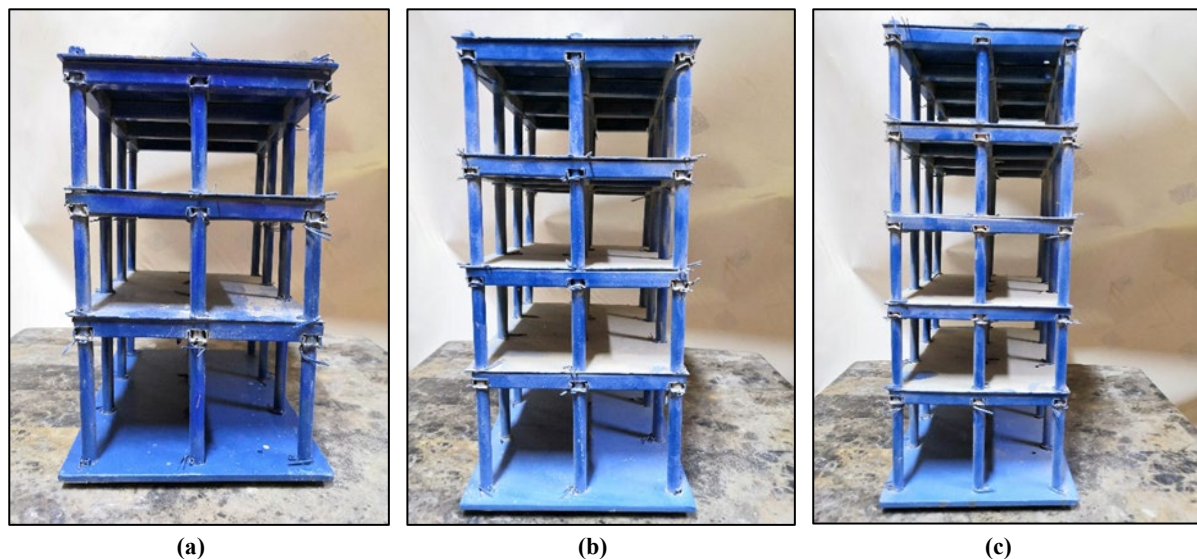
Manufactured steel building frames used in the study: (a) Three-story building (b) Four-story building (c) Five-story building
